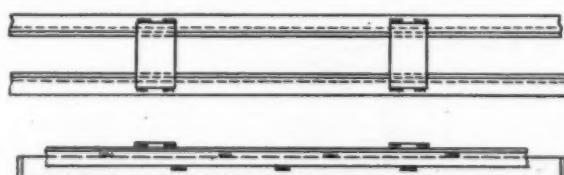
Bottom-Chord Eye-Bars Reinforced by Welding Angles to Bars and Batten Plates to Angles
